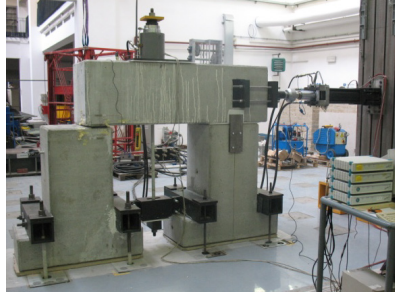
Experimental setup of a monotonic shear test on a beam-to-column dowel connection
